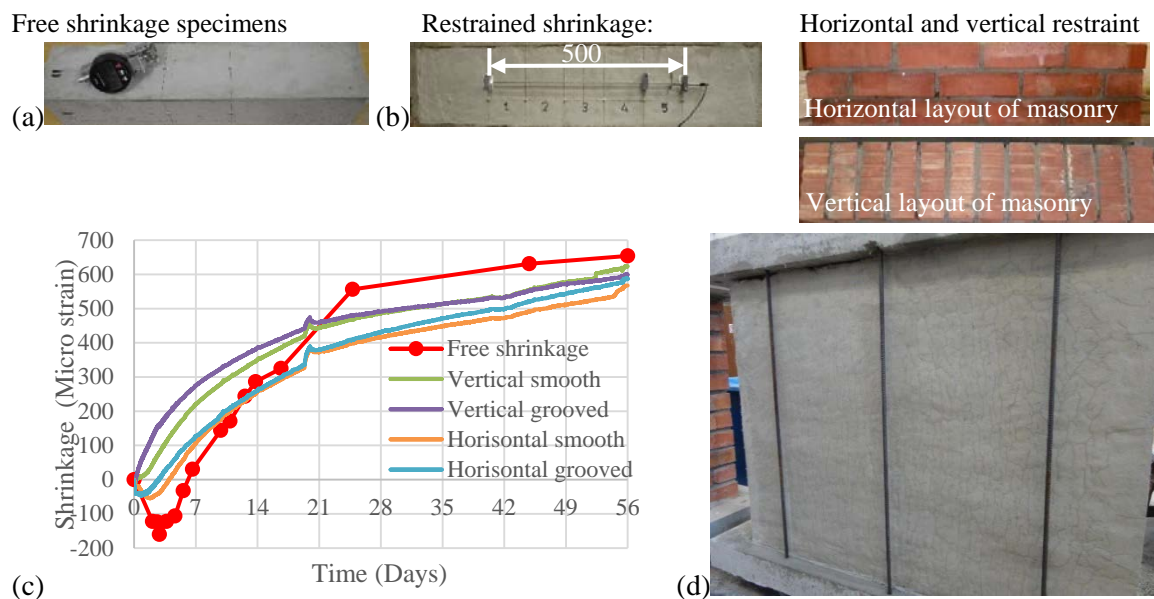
Drying shrinkage measurement on (a) free shrinking SHCC specimens, and on (b) restrained SHCC overlays, showing (c) the shrinkage strain development in time and (d) fine shrinkage cracks on the large shear wall overlay.
